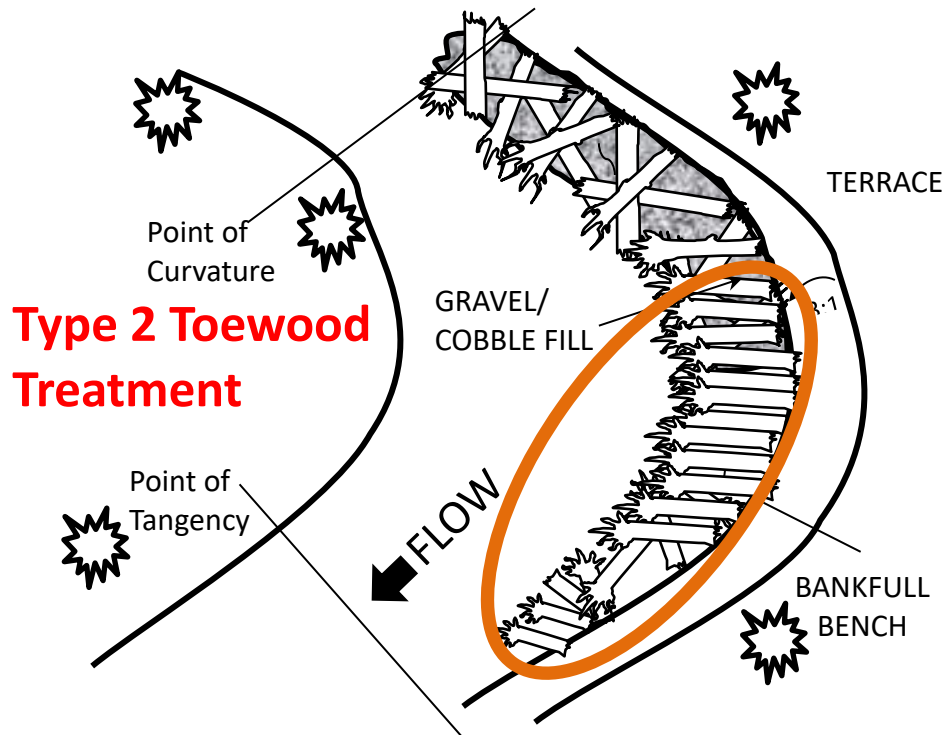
Plan view of the Type 2 toewood treatment concept (circled in orange) and introduction of large wood intentionally placed at the bank toe of the outside bend to function as an undercut bank. Sod mats would normally be placed on top of the large wood, brush (not shown) and top soil layers (not shown).
